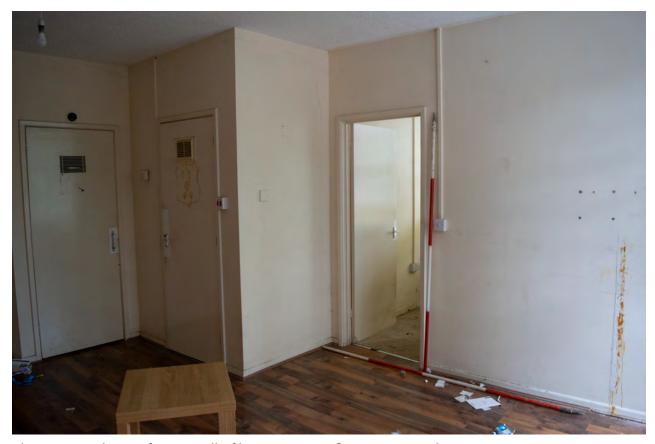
North-east facing wall of living room in flat 3. 2x2m scale.
